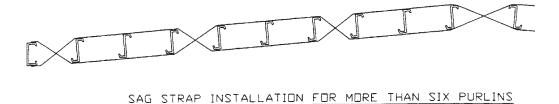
Crisscrossing sag straps. (A&S Building Systems.)
